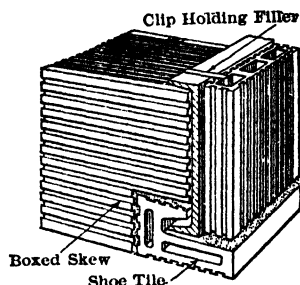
Facia Covering at Stairwells, etc., with Arch on Opposite Side
